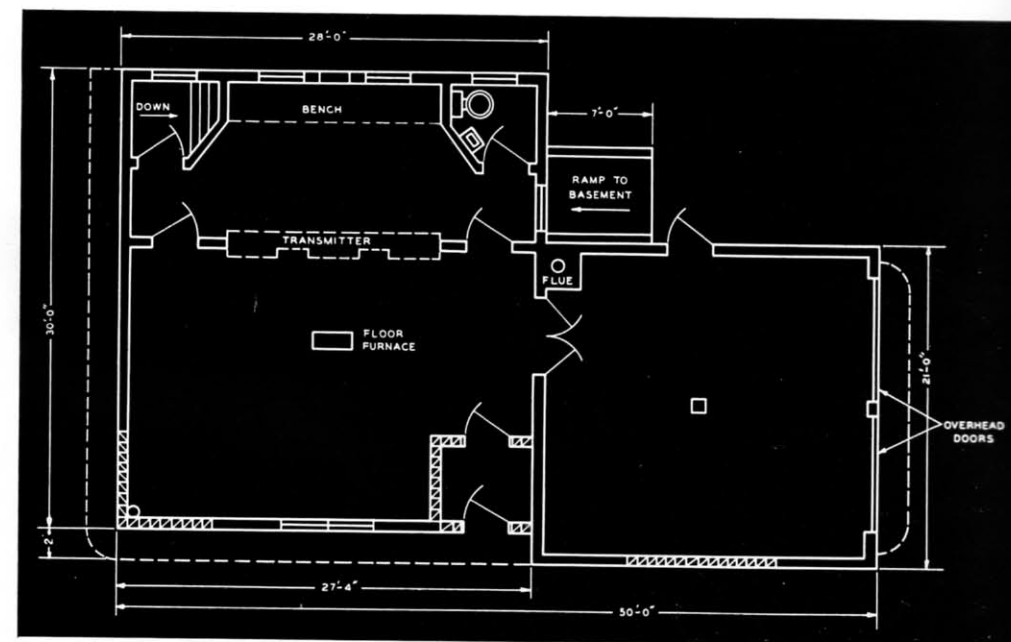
(above). The floor plan illustrates how the BTA-1L is flush-mounted in one wall, with access doors provided at each side of transmitter.
